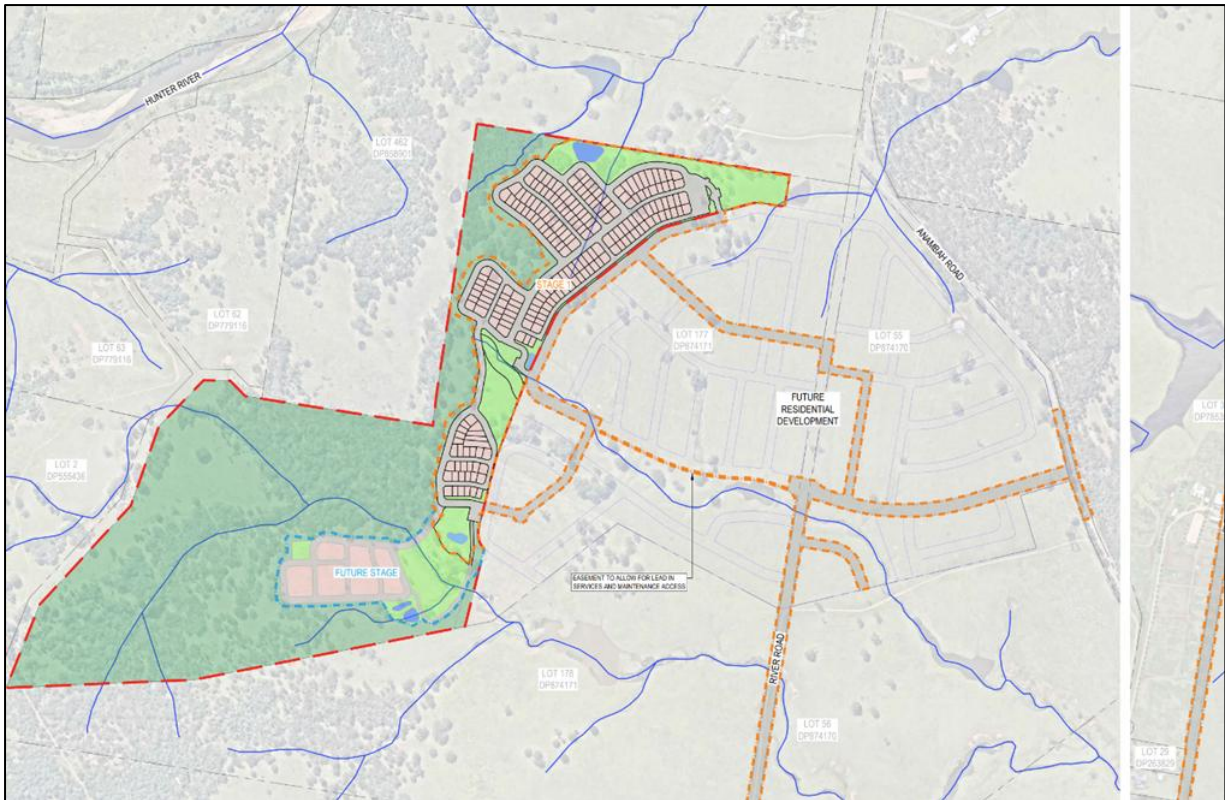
Site plan of proposed MHE development adjacent to the subject development – DA/2025/52 (Concept and Stage 1).
